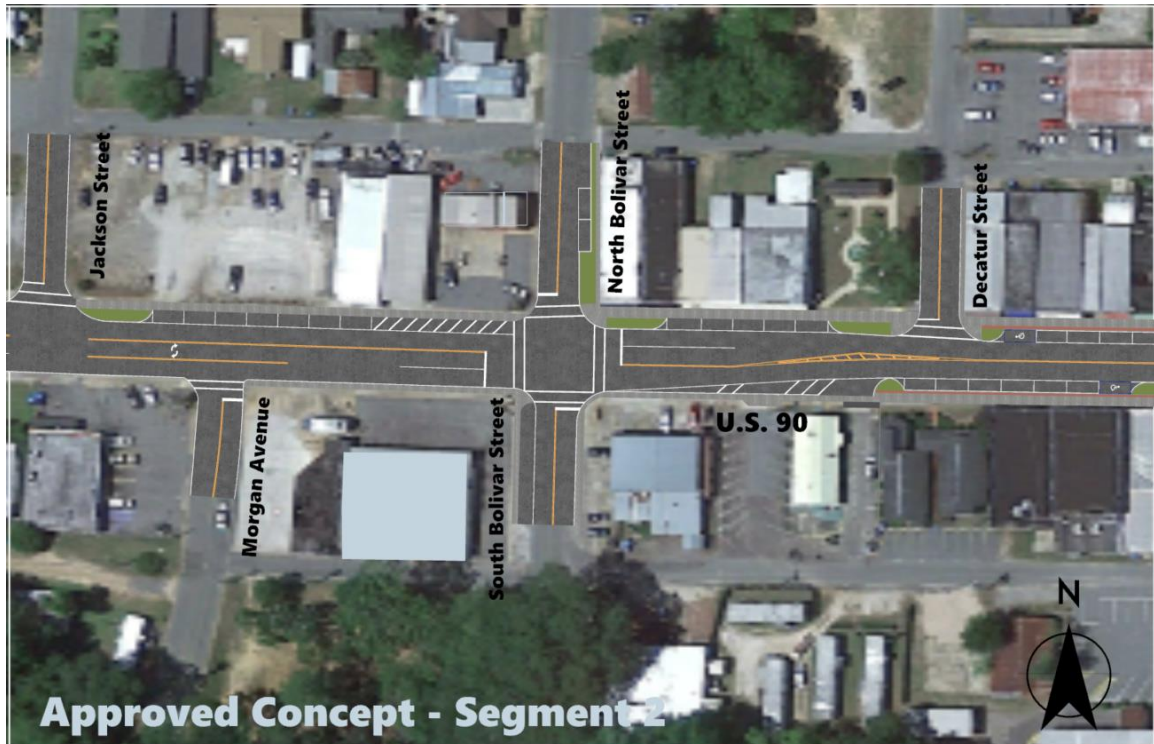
Segment 2 – Jackson Street to Jefferson Street
